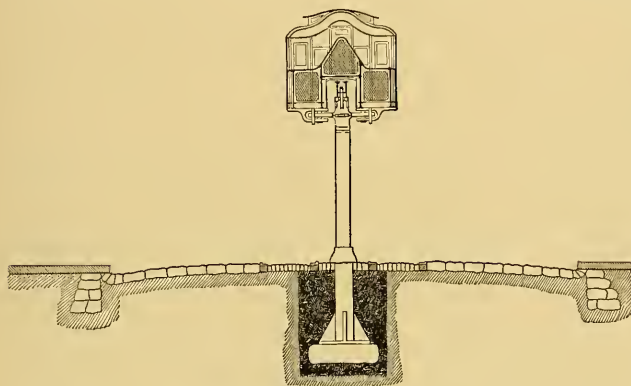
ADAMS' ELEVATED RAILWAY.
